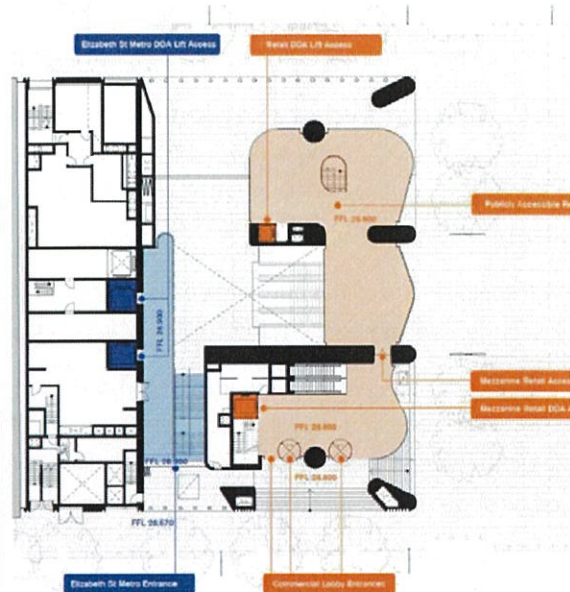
| Upper Ground Floor (Elizabeth Street) showing relationship between proposed OSD and station works (Source: Applicant's RtS)
